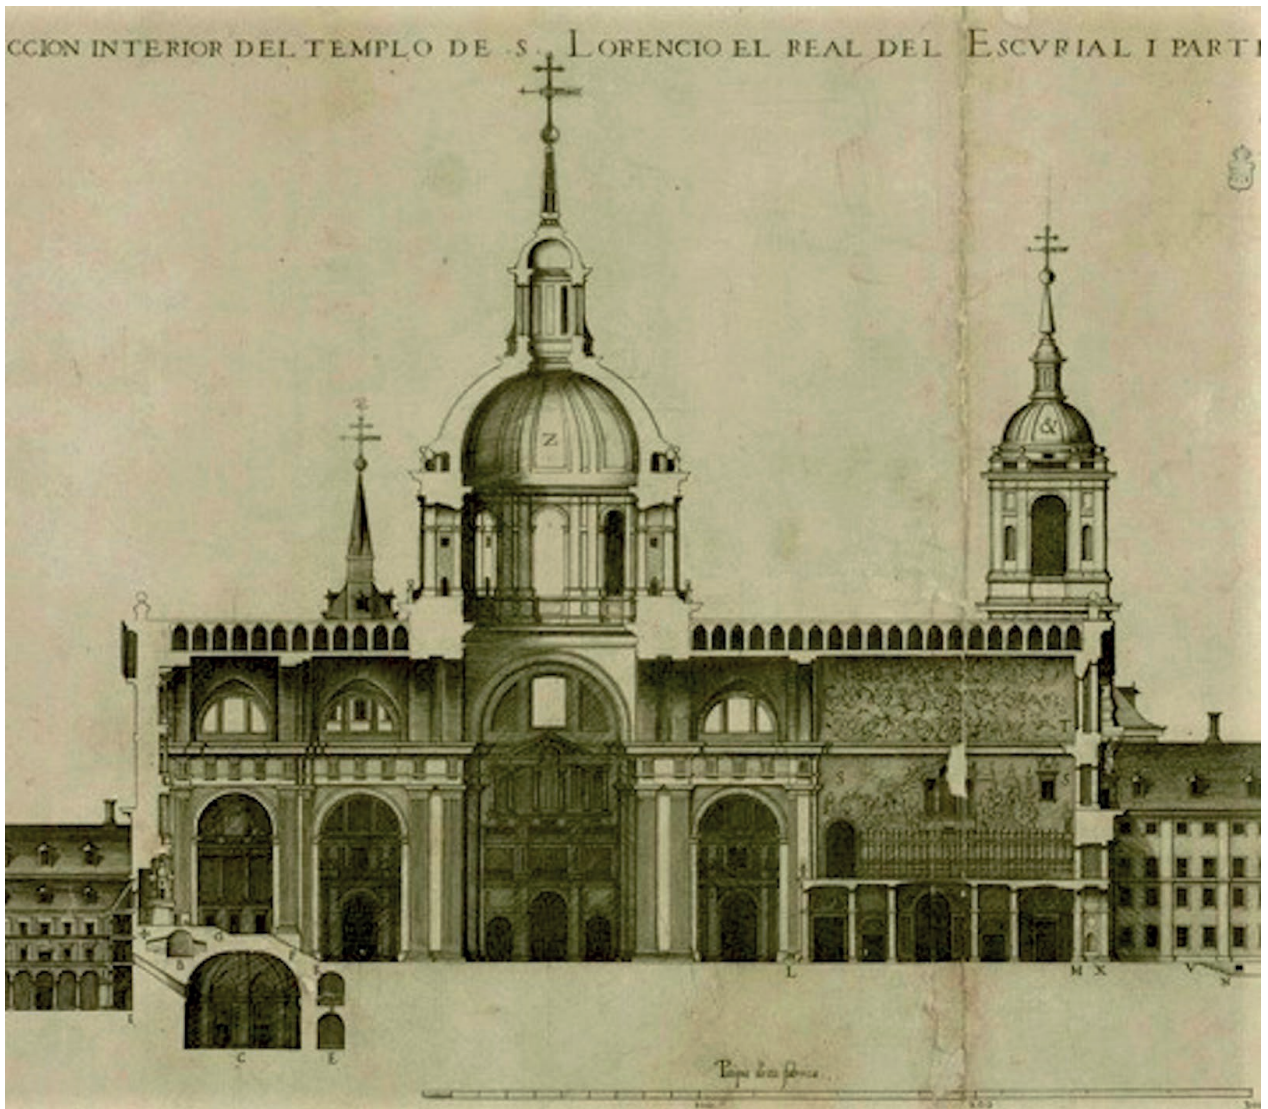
Cross-section of the Church of San Lorenzo de El Escorial. Detail from longitudinal section. 1587 Perret (Ref.web1, web2, web3).<sup>14</sup>
